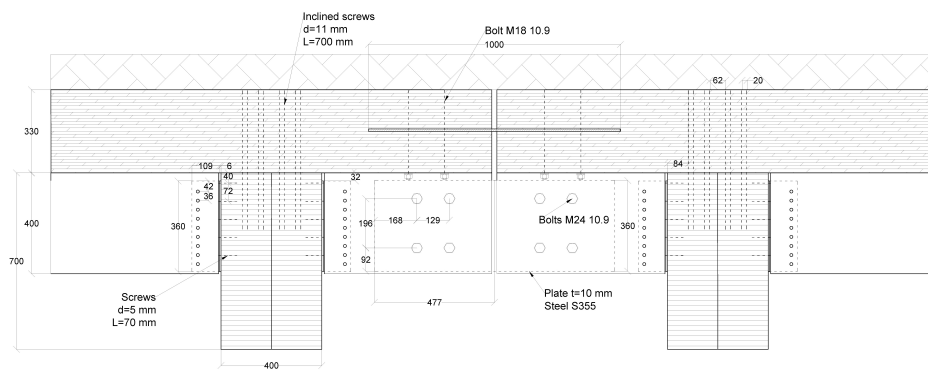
Connection of cross girders to cross girders and cross girders to main girders. Joint between deck panels in the y-direction is presented as well.
